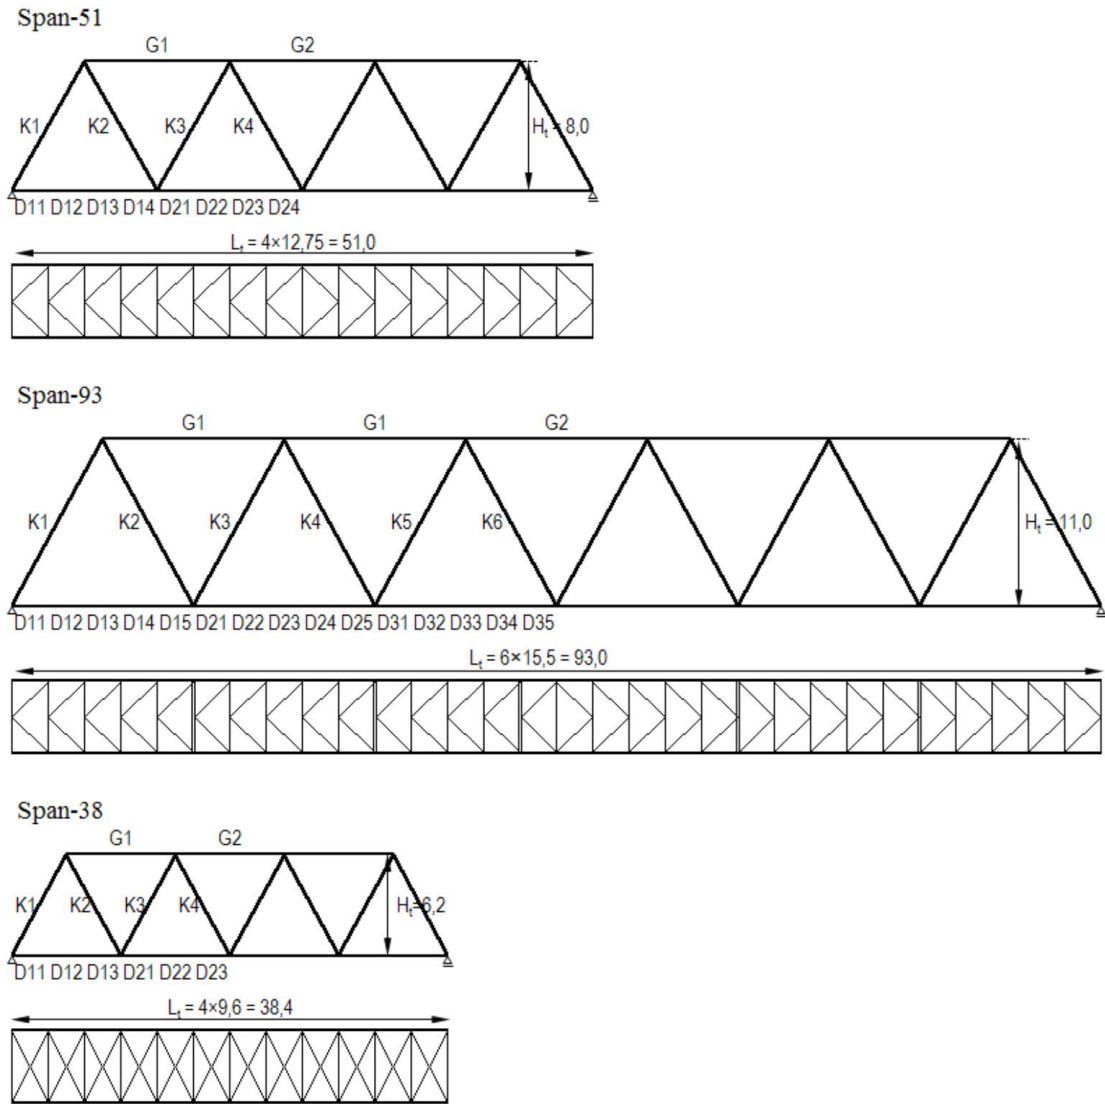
Layouts of truss girders and decks of the analyzed bridge spans
